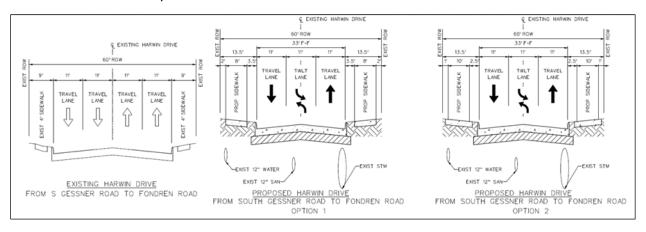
Harwin Dr Reconstruction Existing and Proposed Sections
